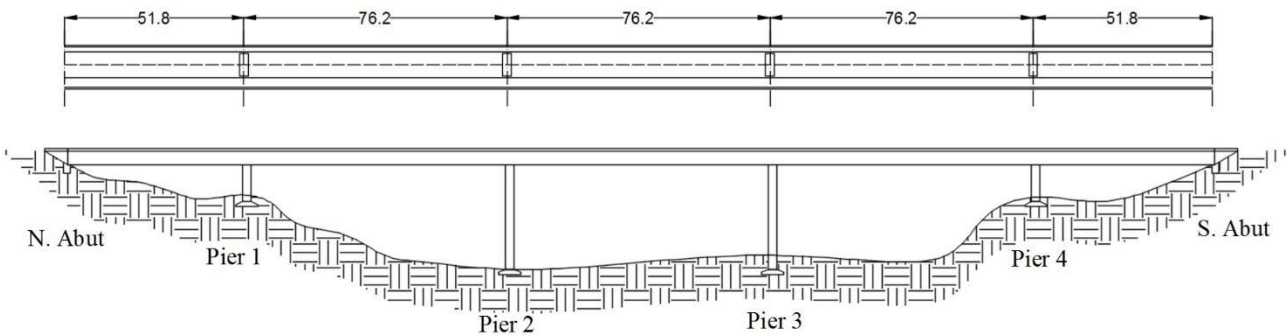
Plan and elevation views of the Kishwaukee bridge (units in meter)
